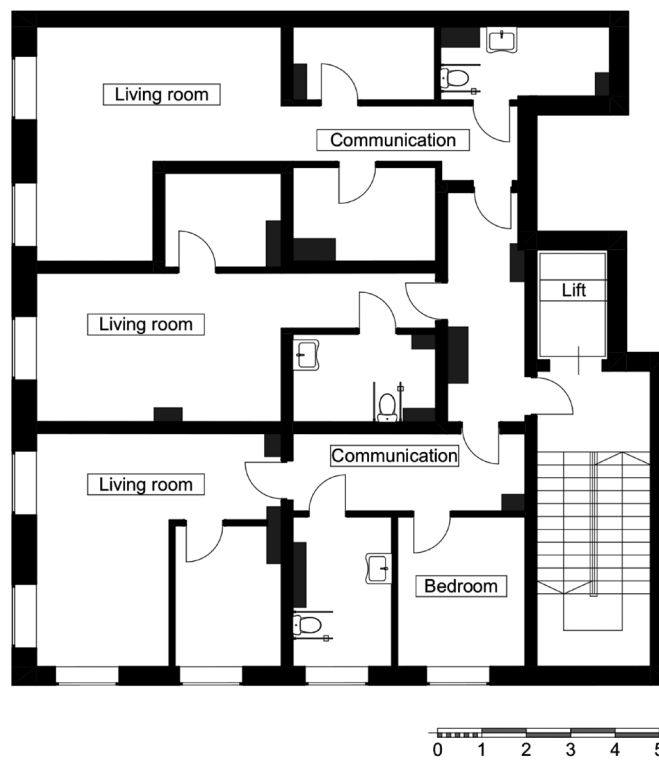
Floor plan of the first floor of the Multigenerational House in Lodz
